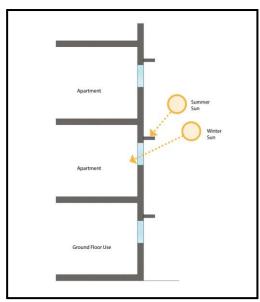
Window shading to north-facing apartments (Image source: GCC)
